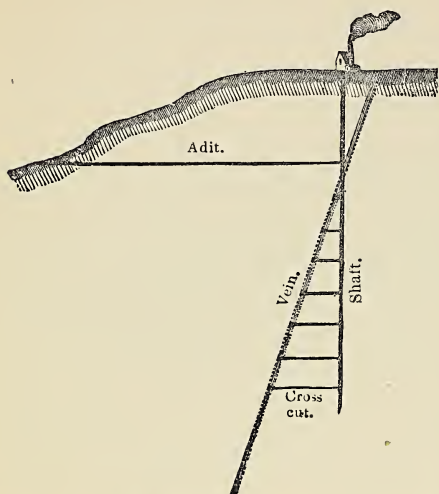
Cross Section, showing the progress of a shaft after cutting the vein.
